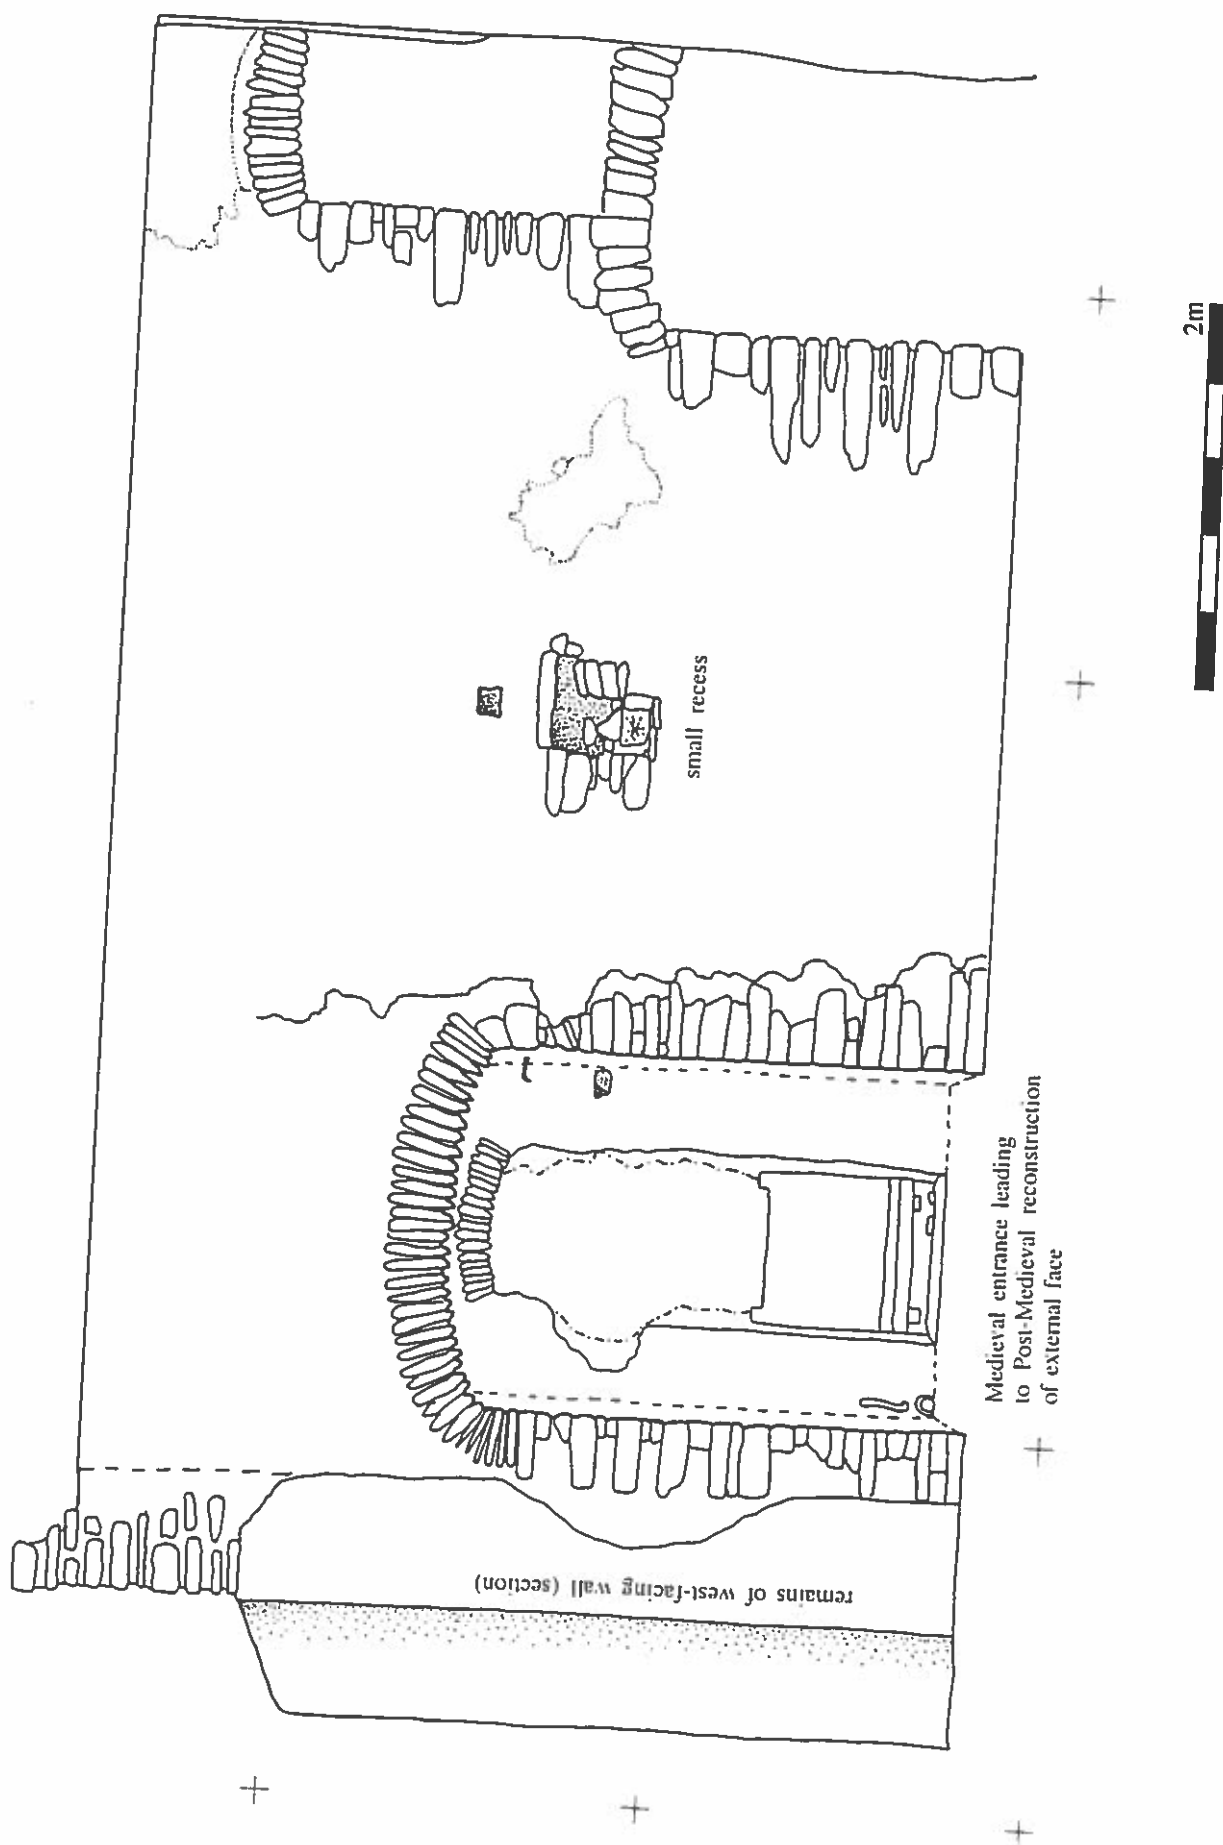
NORTH-FACING EXTERNAL ELEVATION
